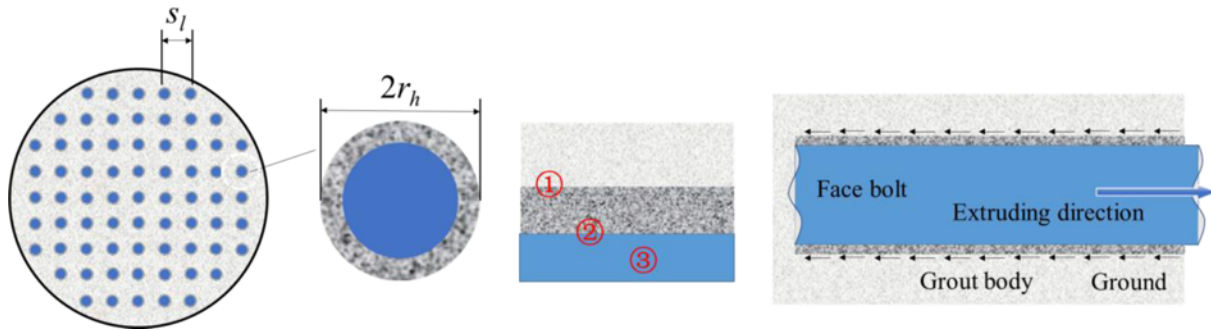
The Failure Modes of the Tunnel Face Bolt
